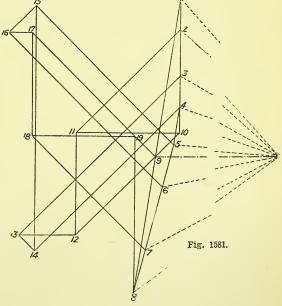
and 1581.—Frame and Stress Diagrams of Hammer-Beam Truss.
